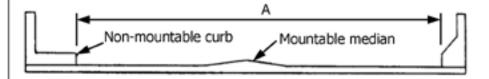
Cross-section view of a highway feature carried on the bridge with a mountable median.
